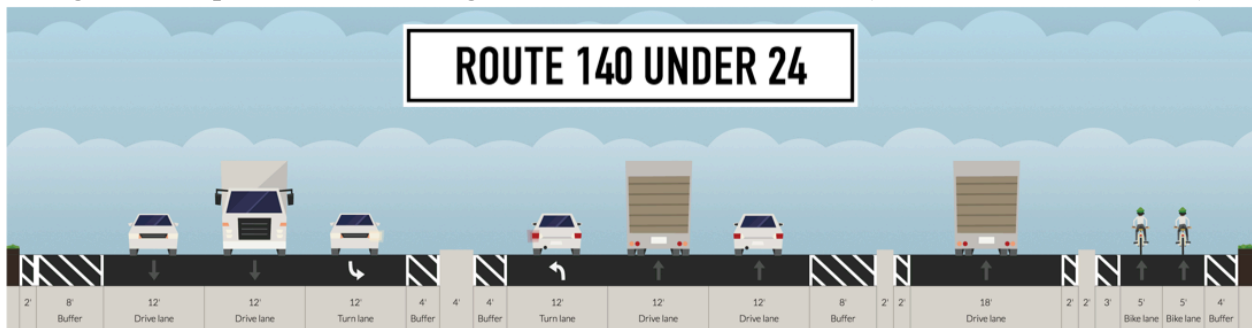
Proposed Route 140 cross-section under Route 24 (with center pier) (Version 2, StreetMix 2017).
